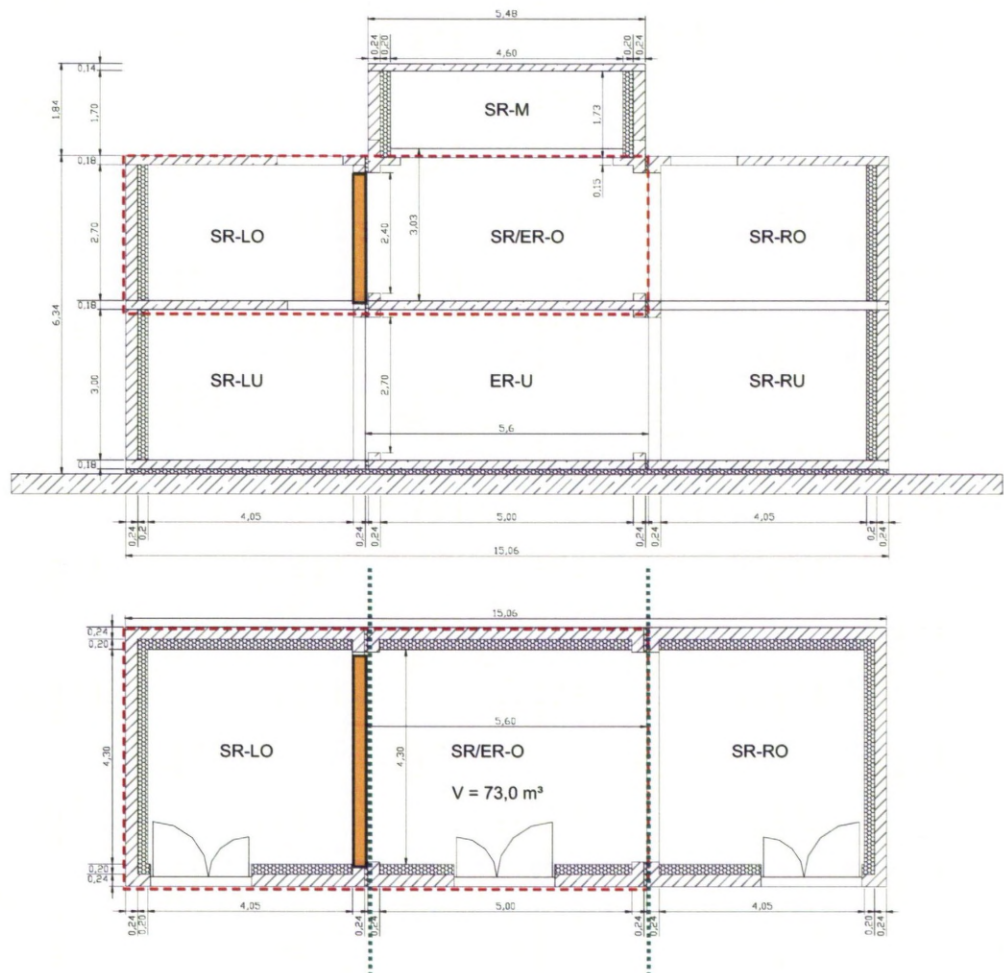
Staircase test facility: vertical section and ground plan of the 1st level used for investigations
